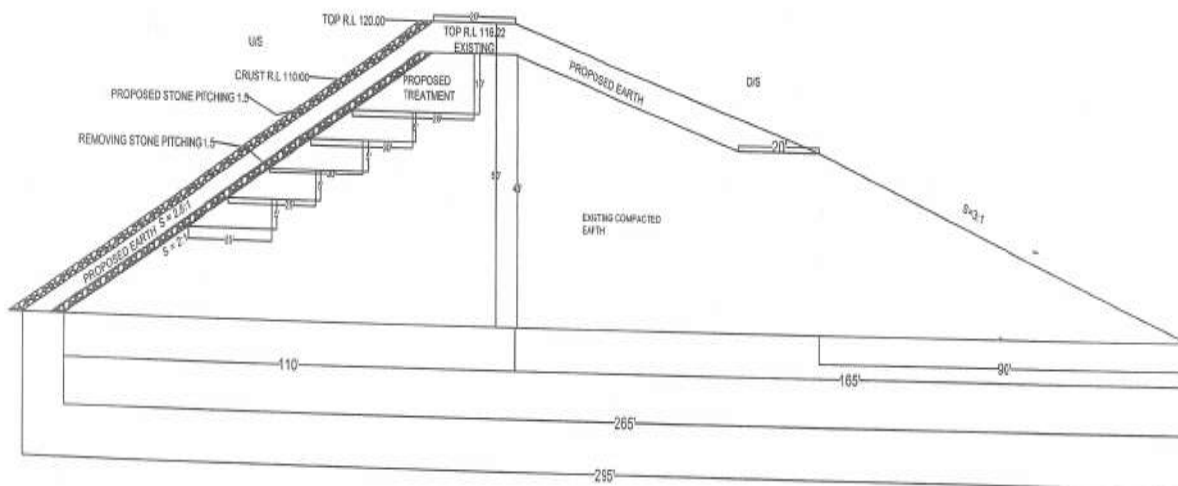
Typical X-Section Shagai-1 Delay Action Dam RD 800
